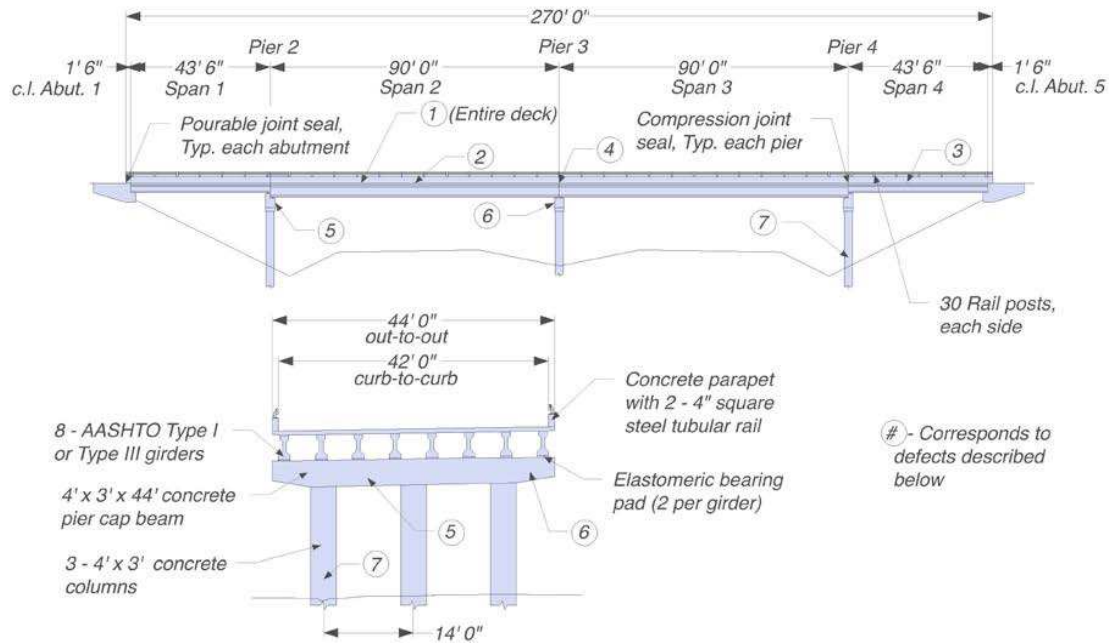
Elevation and Typical Section of Bridge for Prestressed Concrete Girder Example
